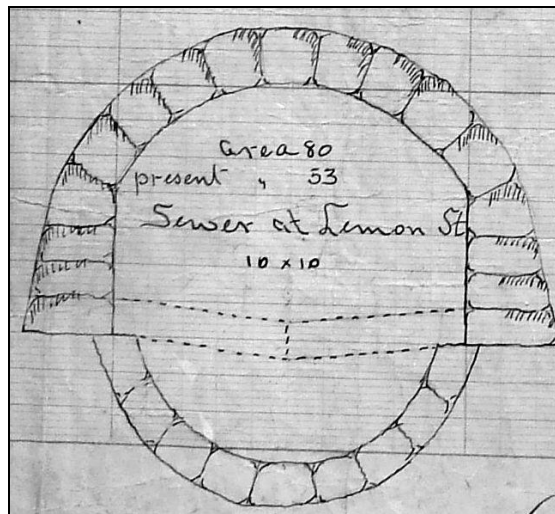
Bee Branch storm sewer design, Lemon Street transition point, section
